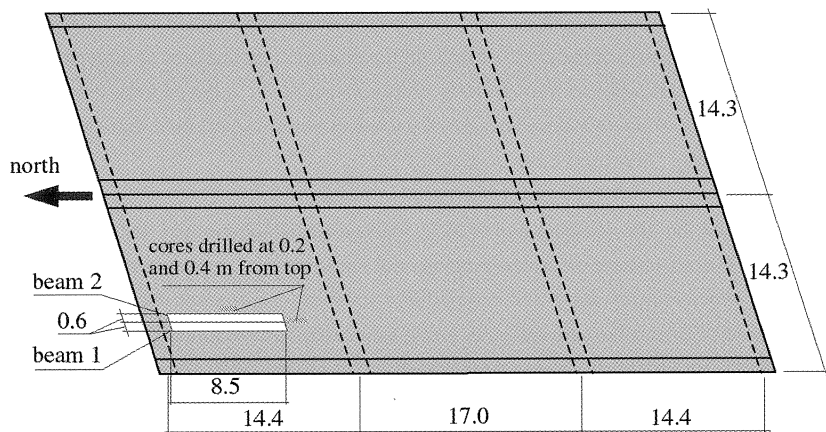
Position of beams and horizontal cores in north-west span of ZB-bridge
